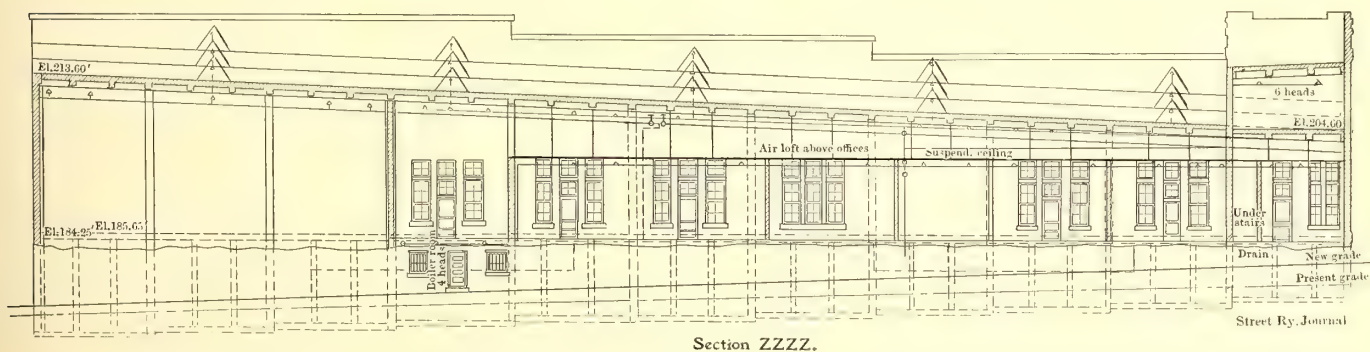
LONGITUDINAL SECTION OF EDMONDSON AVENUE CAR HOUSE ON LINE ZZZZ (SEE PAGE 182), SHOWING ROOF SPRINKLERS
